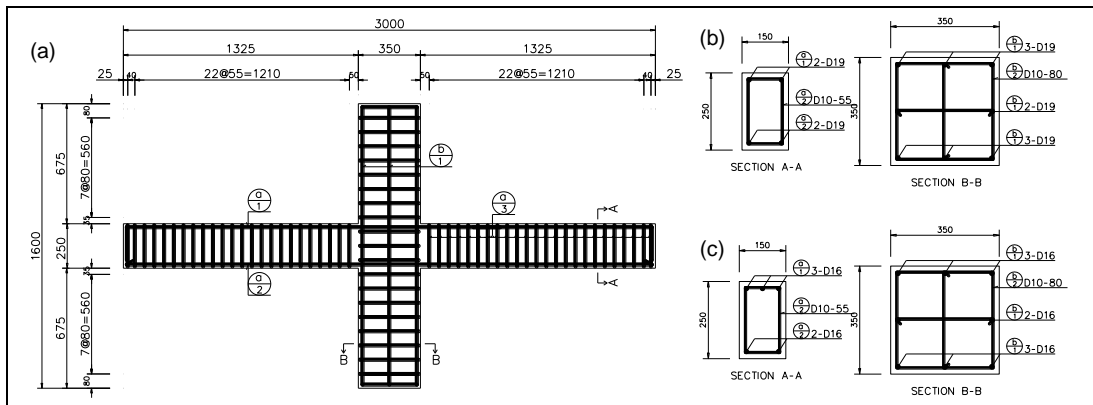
Reinforcement detail of all specimens, (a) elevation view of specimen's reinforcing bars, (b) beam and column section for D19-500N and D19-500F specimens, (c) beam and column section for D16-400N, D16-500N, and D16-500F specimens
